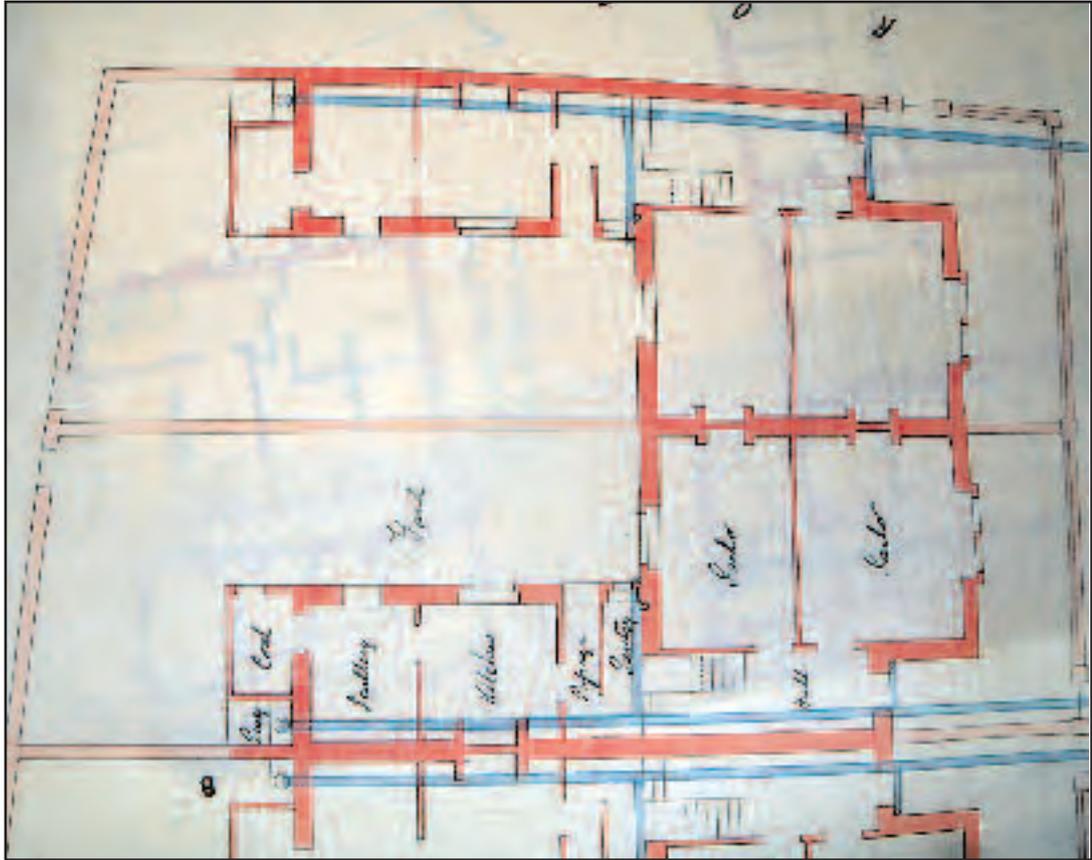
Ground floor plan, 34 & 35 St Michael's Park, 1874
